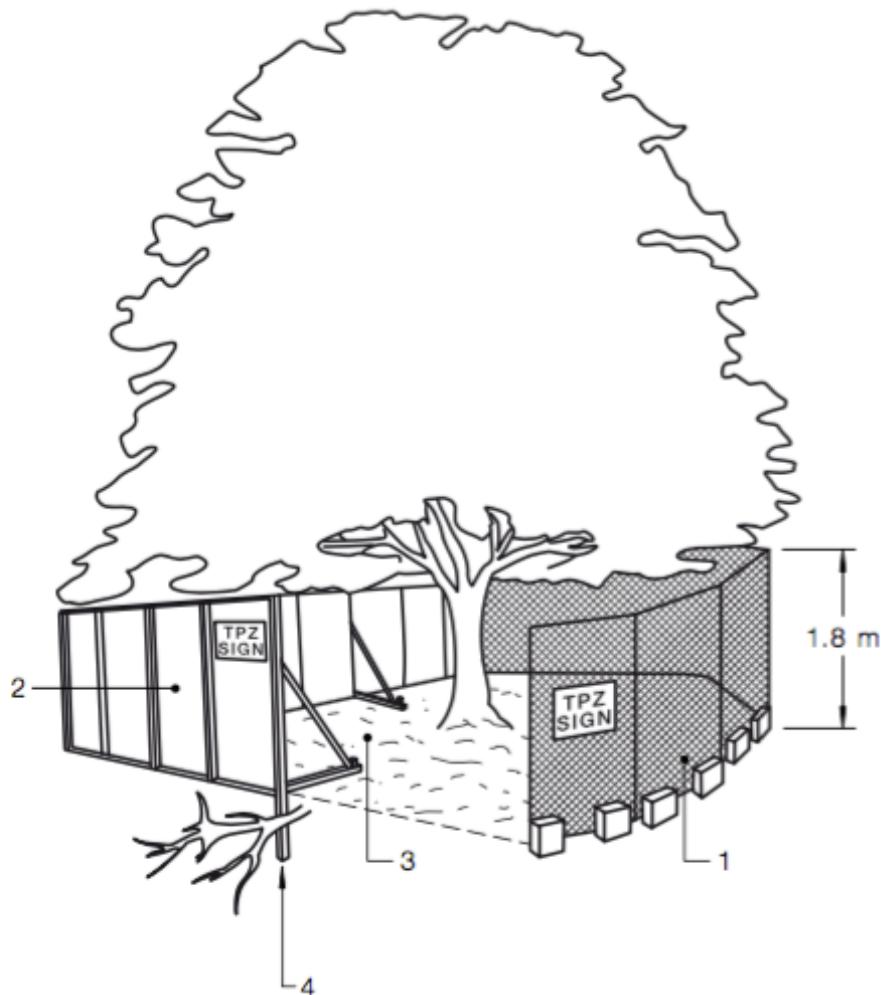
Example tree protection zone with fencing, signage, mulch and bracing (AS4970-2009).
